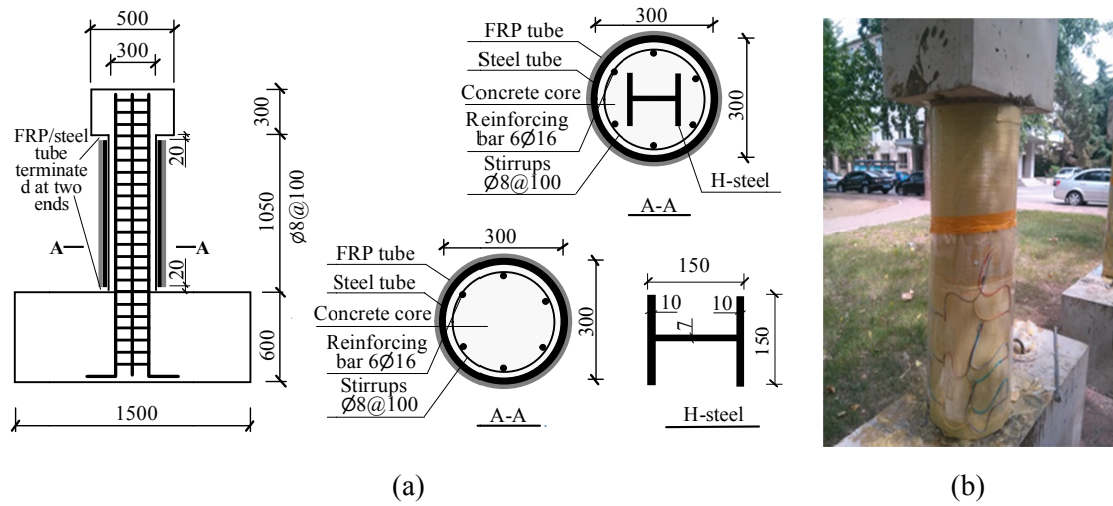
Details of test specimens (Units in mm): (a) Dimension and reinforcement arrangement; (b) Confined columns
